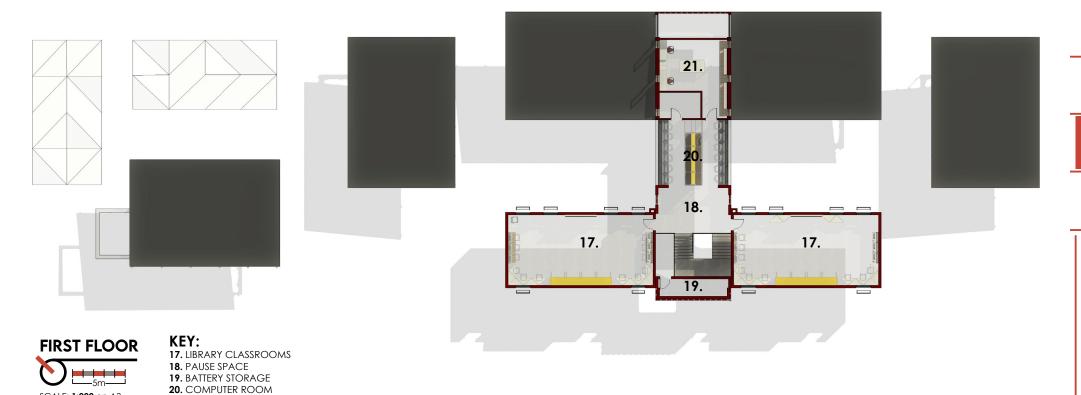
Design resoultion: first floor, (Author, 2021)
